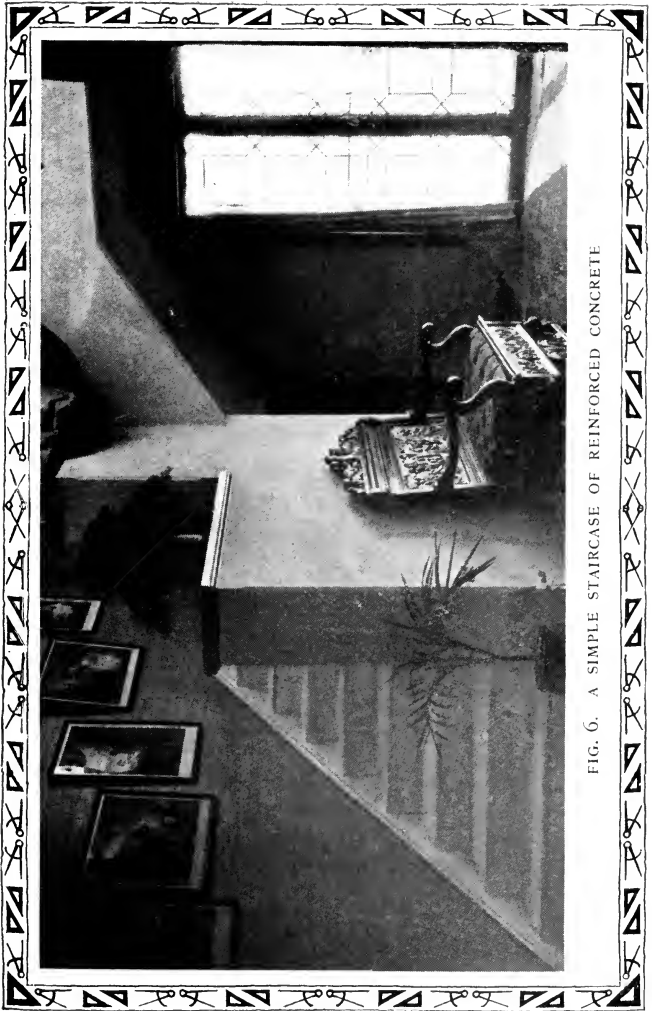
A SIMPLE STAIRCASE OF REINFORCED CONCRETE
